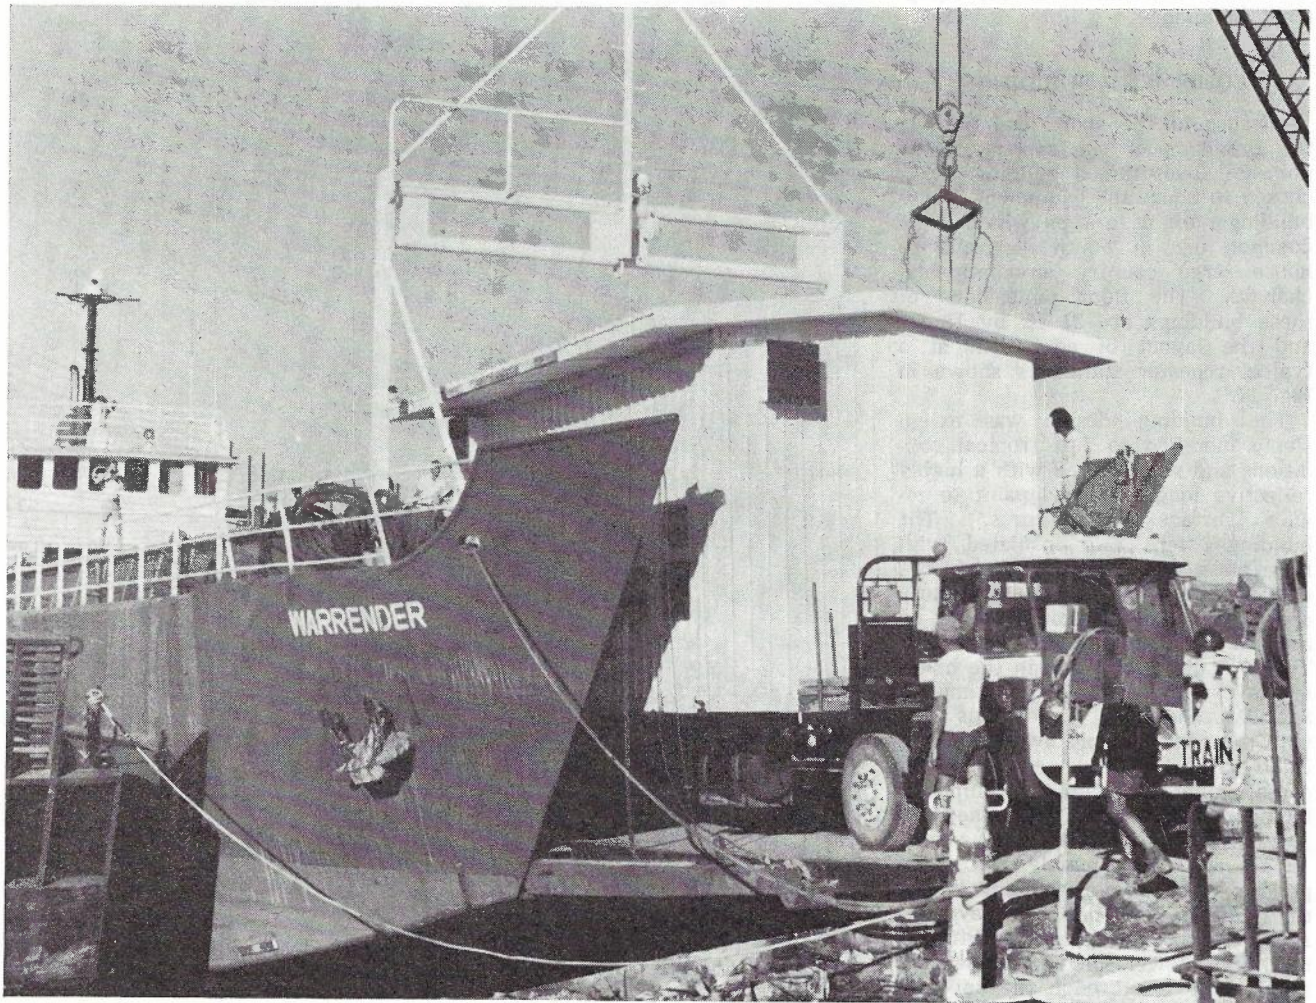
Loading Milingimbi Shelter on Barge at Darwin.
